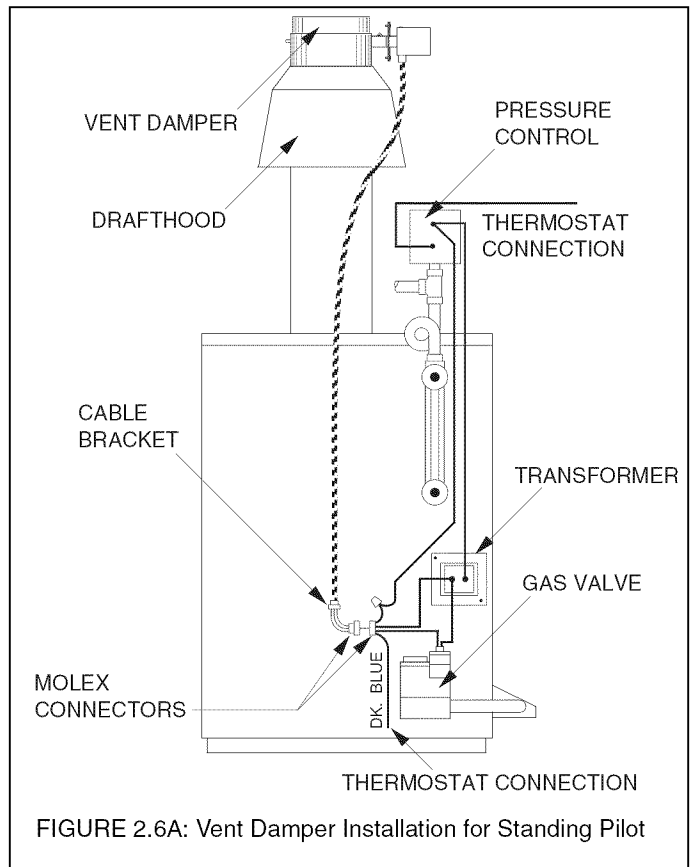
A: Vent Damper Installation for Standing Pilot
